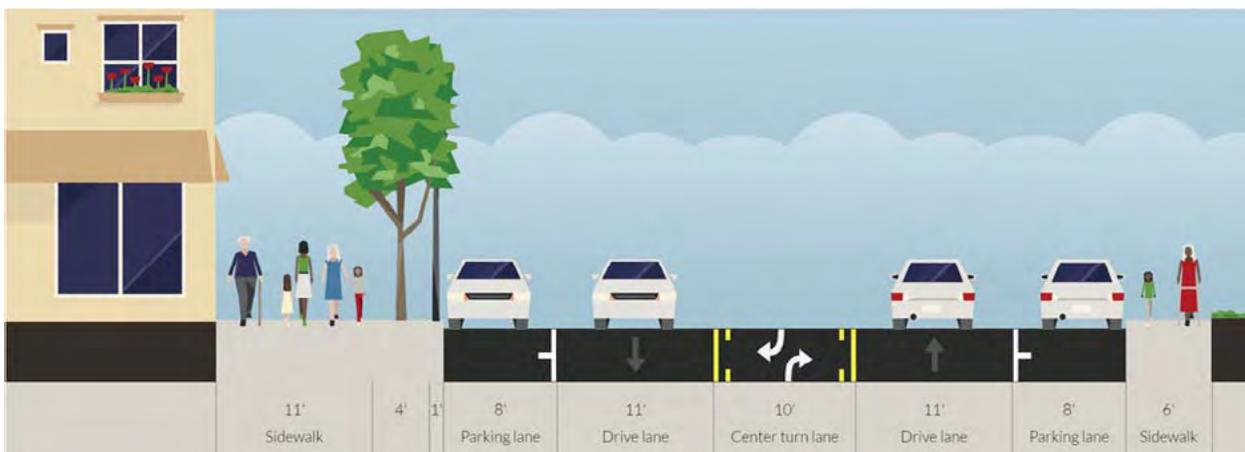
PROPOSED SECTION OF GREEN BAY ROAD (SPRUCE – ELM)
